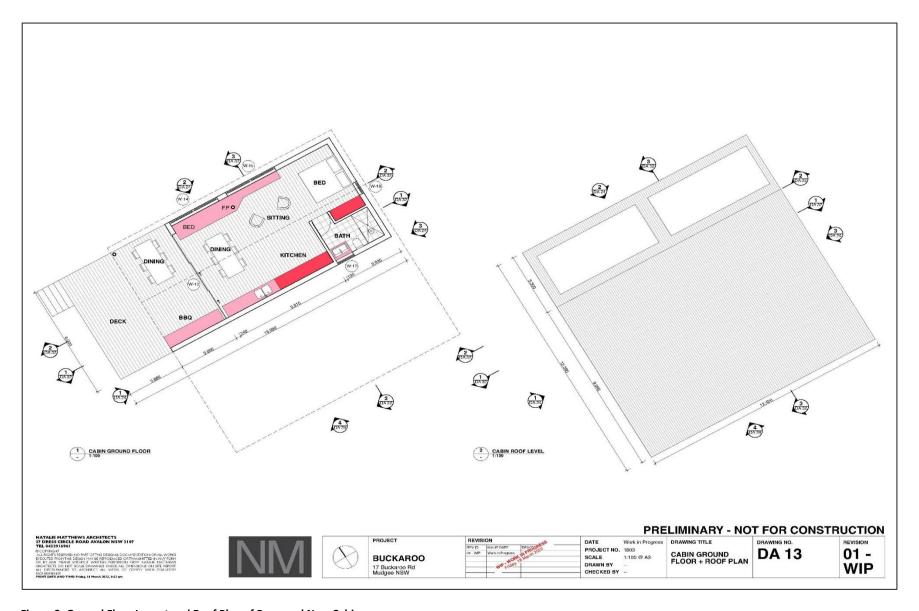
Ground Floor Layout and Roof Plan of Proposed New Cabin
